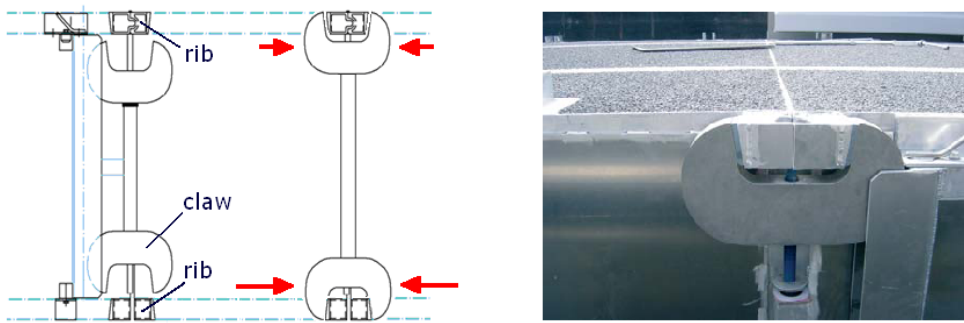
autoCAD drawing of cross-section and a close up of a row lock
